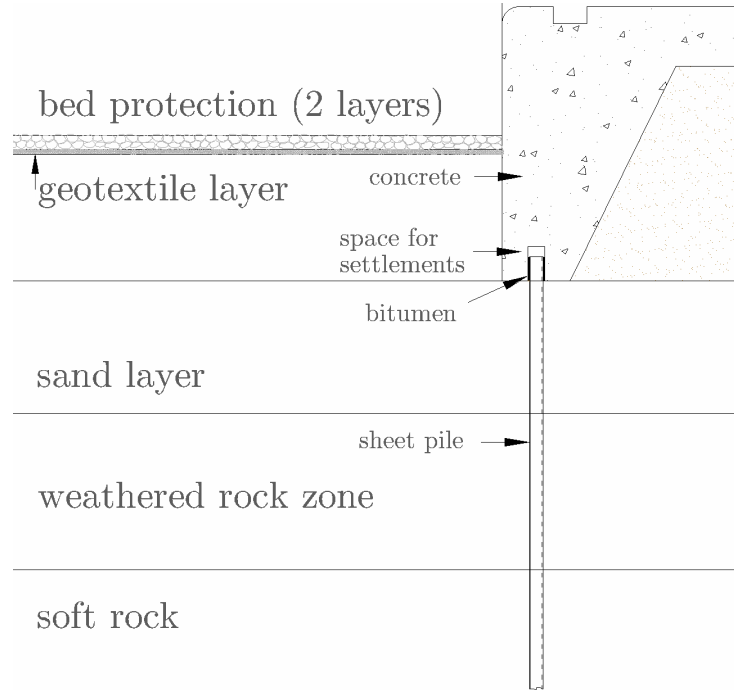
Detail: Connection between sheet pile and concrete structure
